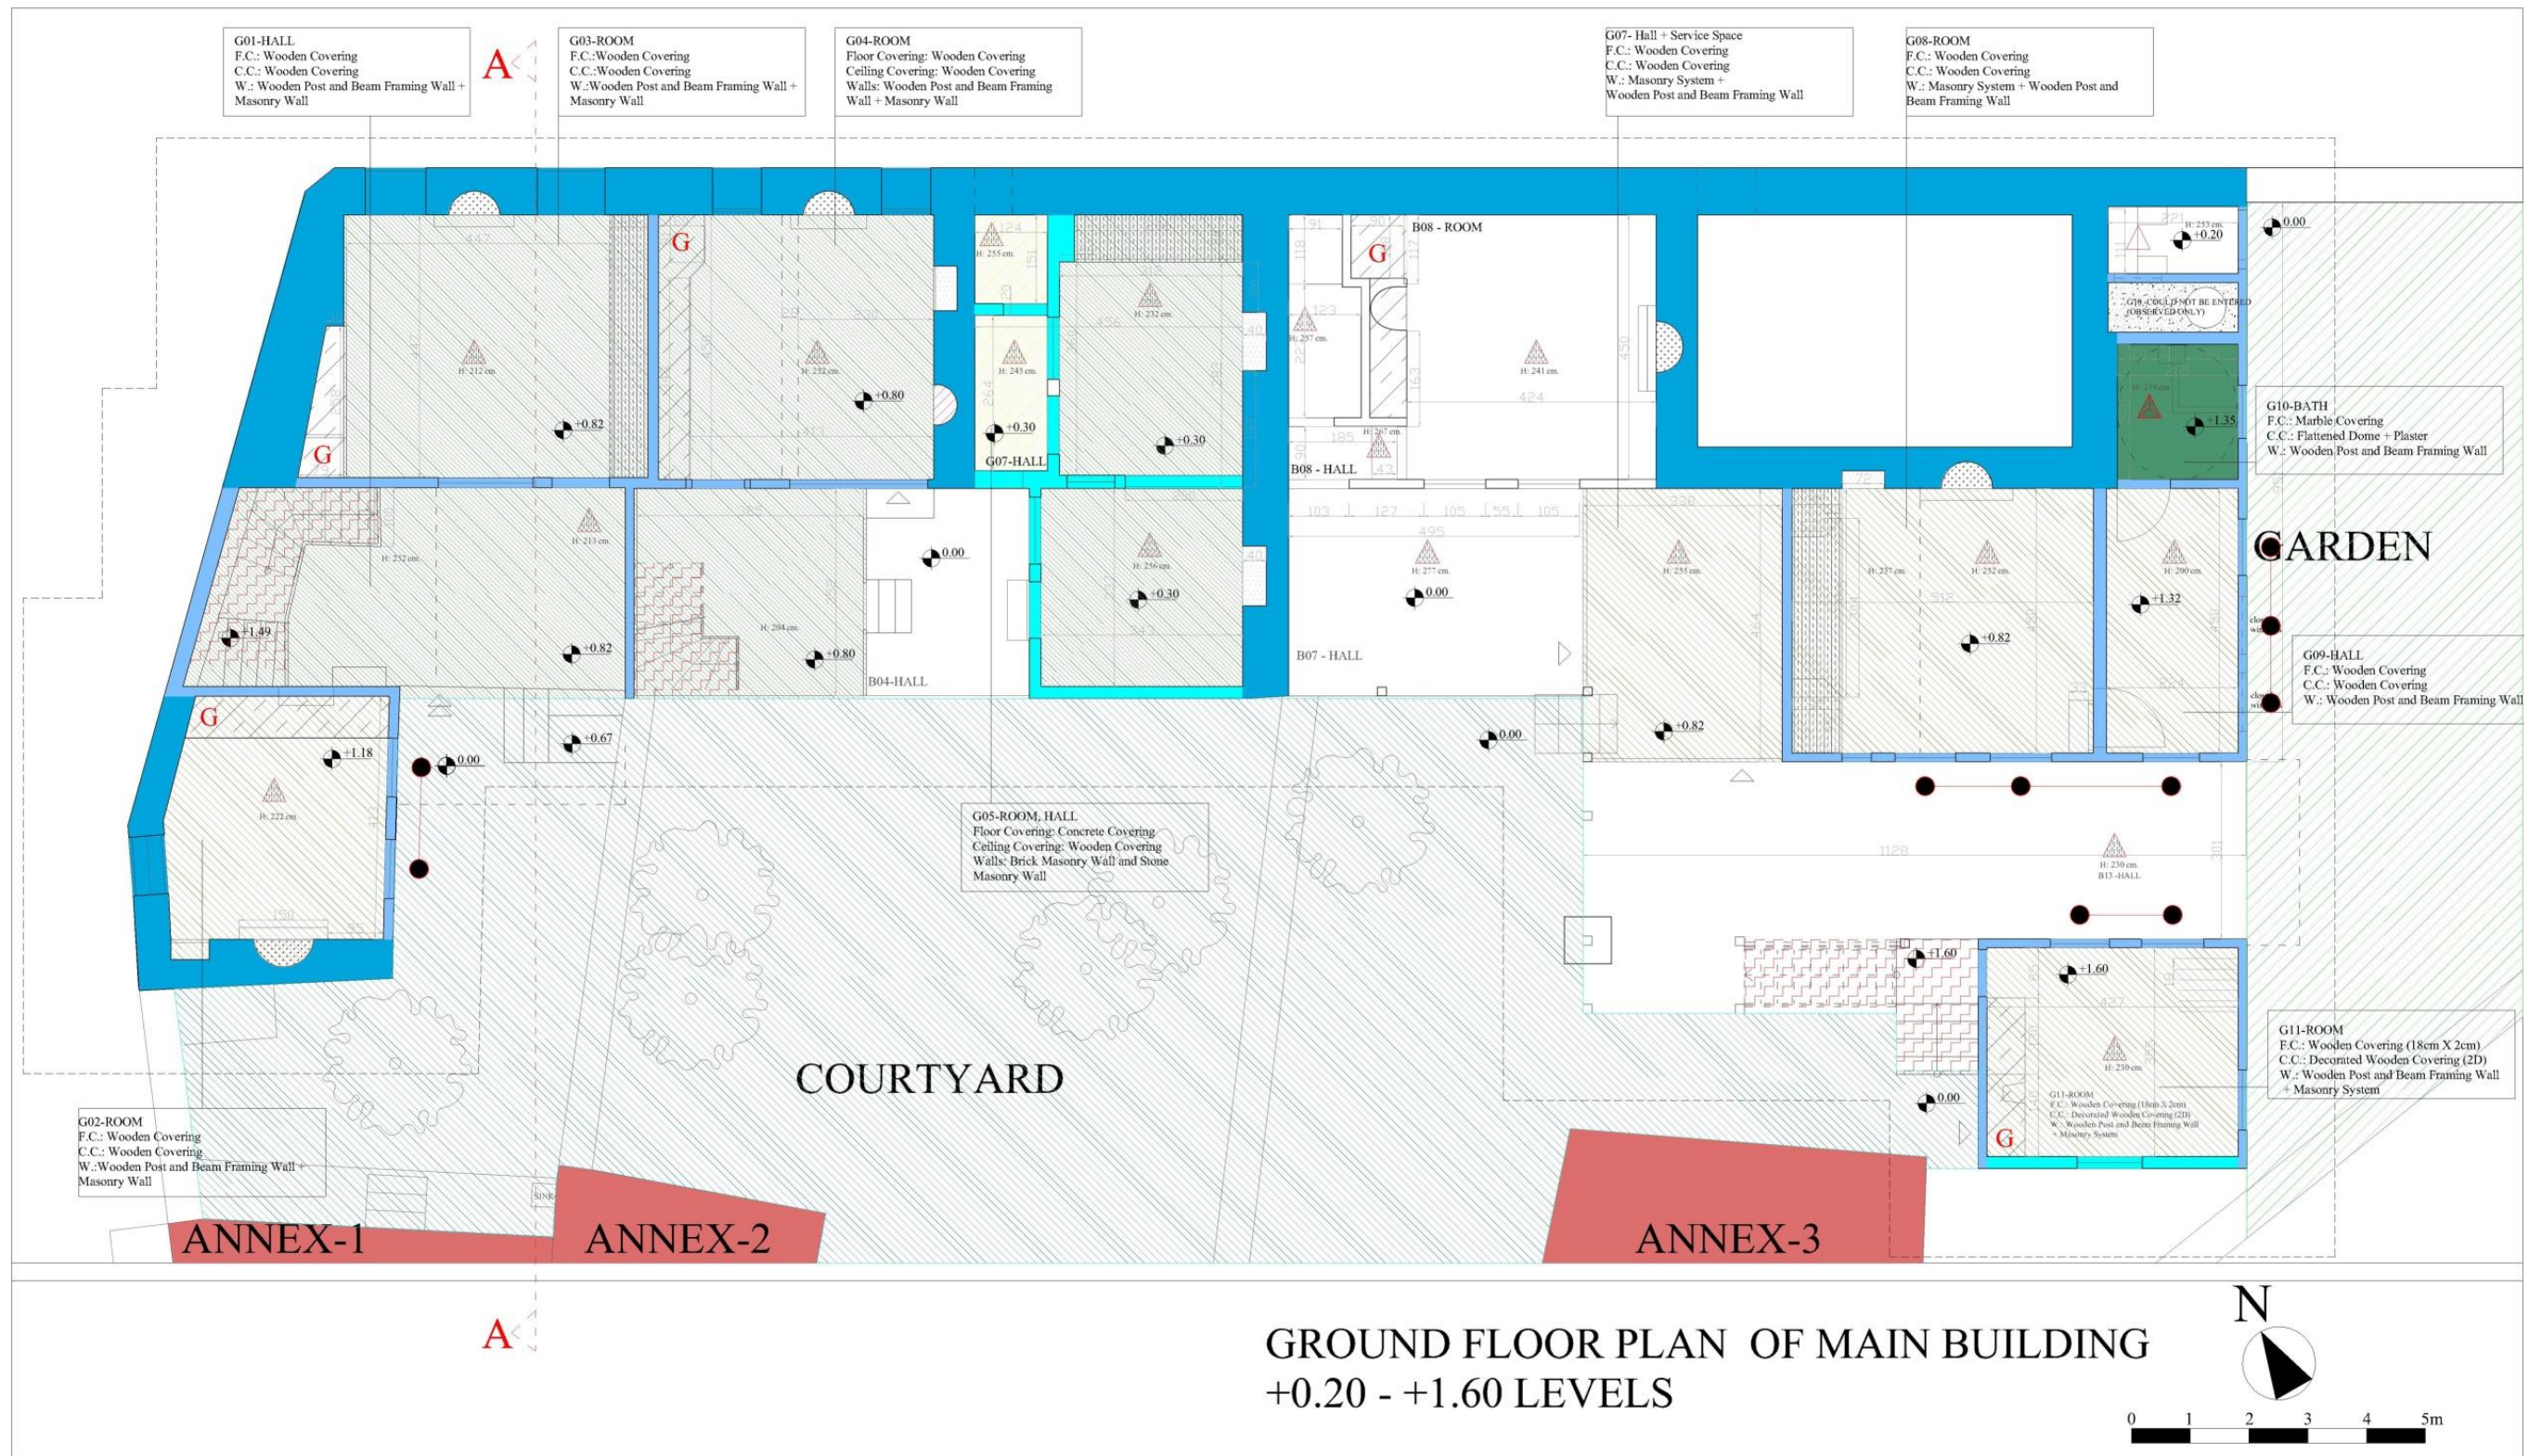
Structural Characteristics: Ground Floor Plan (+0.20 and +1.60 Level)
